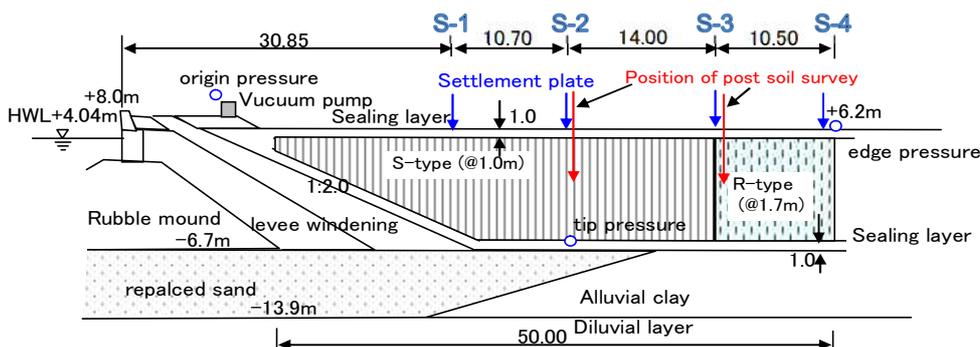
Design of ground improvement and monitoring plan in vacuum consolidation
